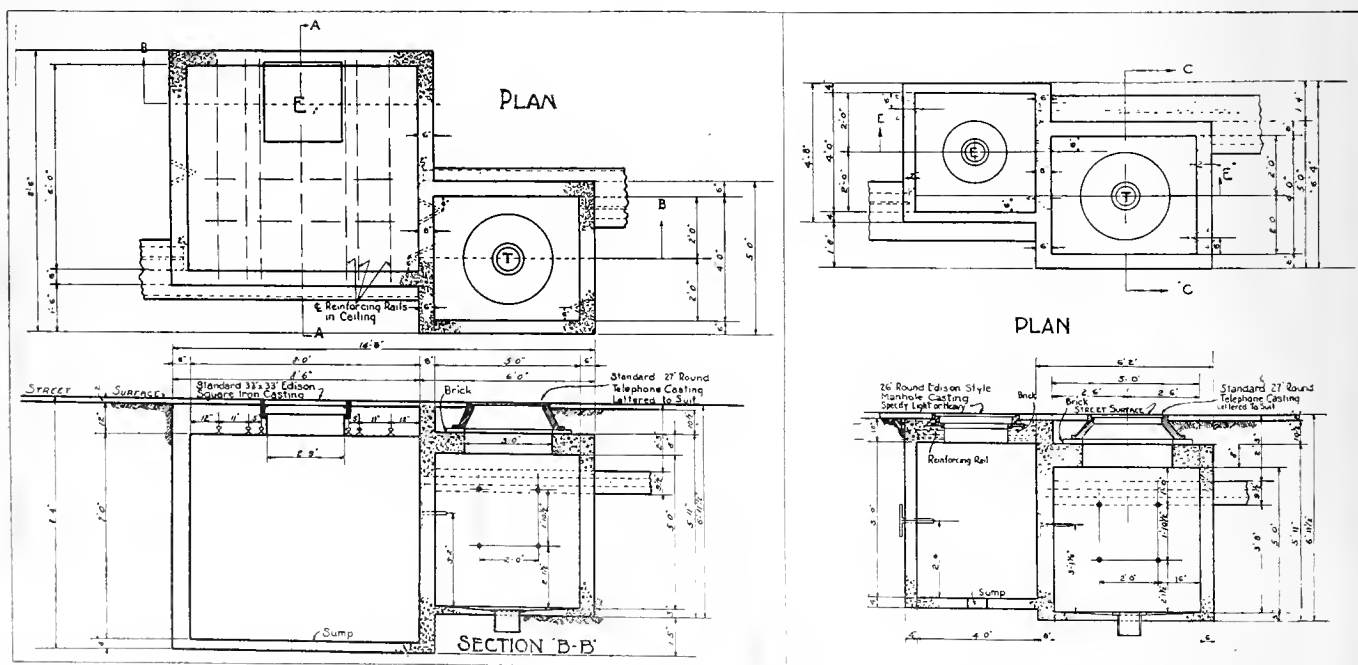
Plans of the manholes used in connection with the Samarkand Hills underground system. At left the primary manholes, at right those for secondary distribution. The telephone manholes are shown adjoining, marked "T."
